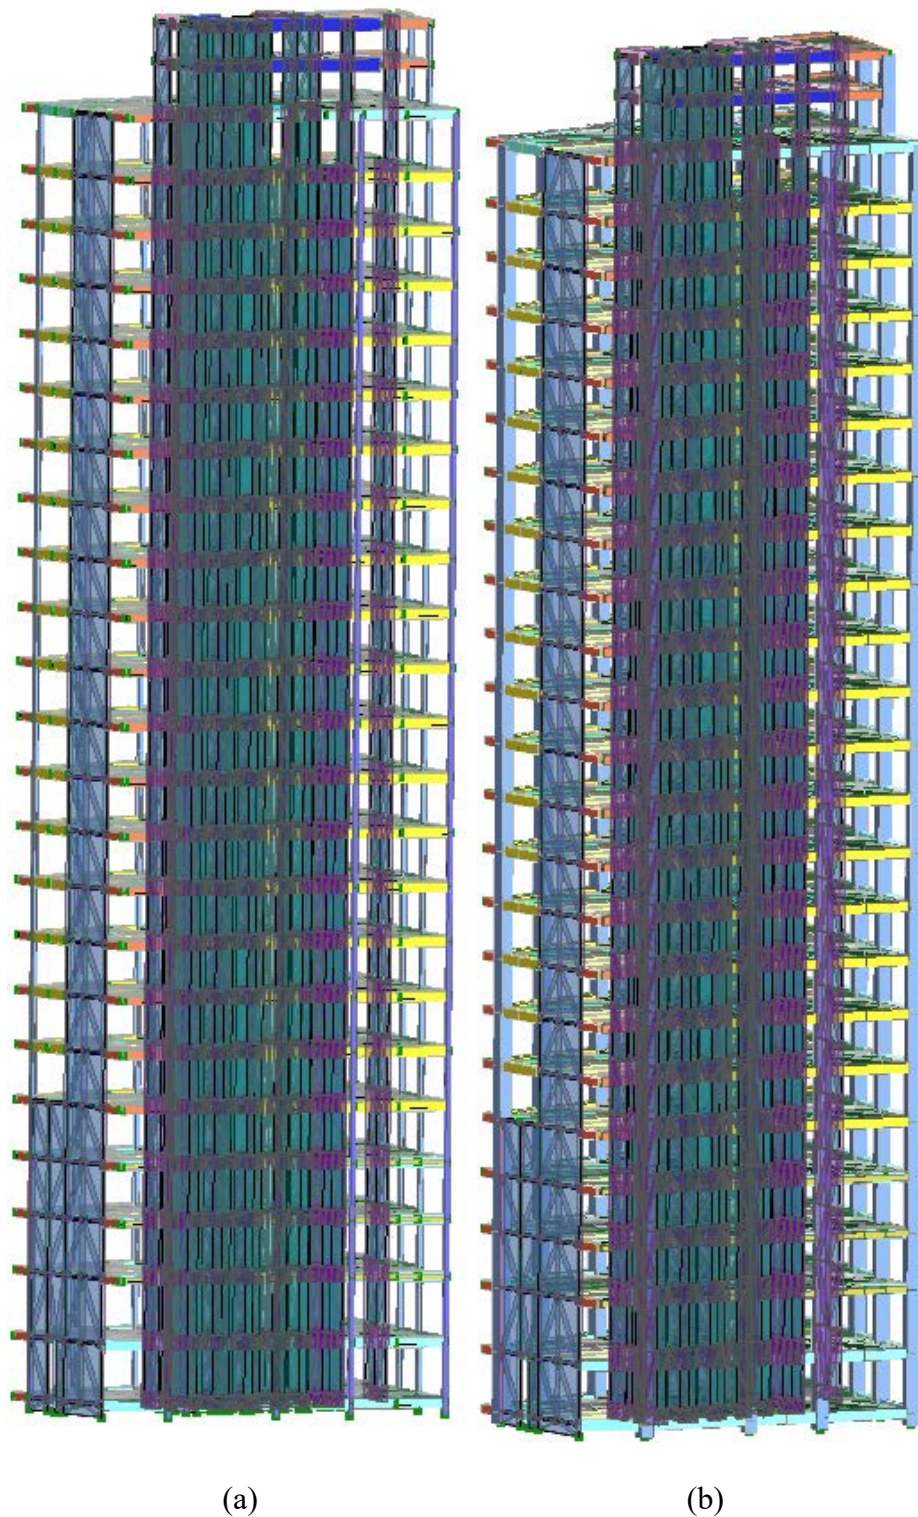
13 Configuration of (a) Steel Building and (b) Reinforced Concrete Building
